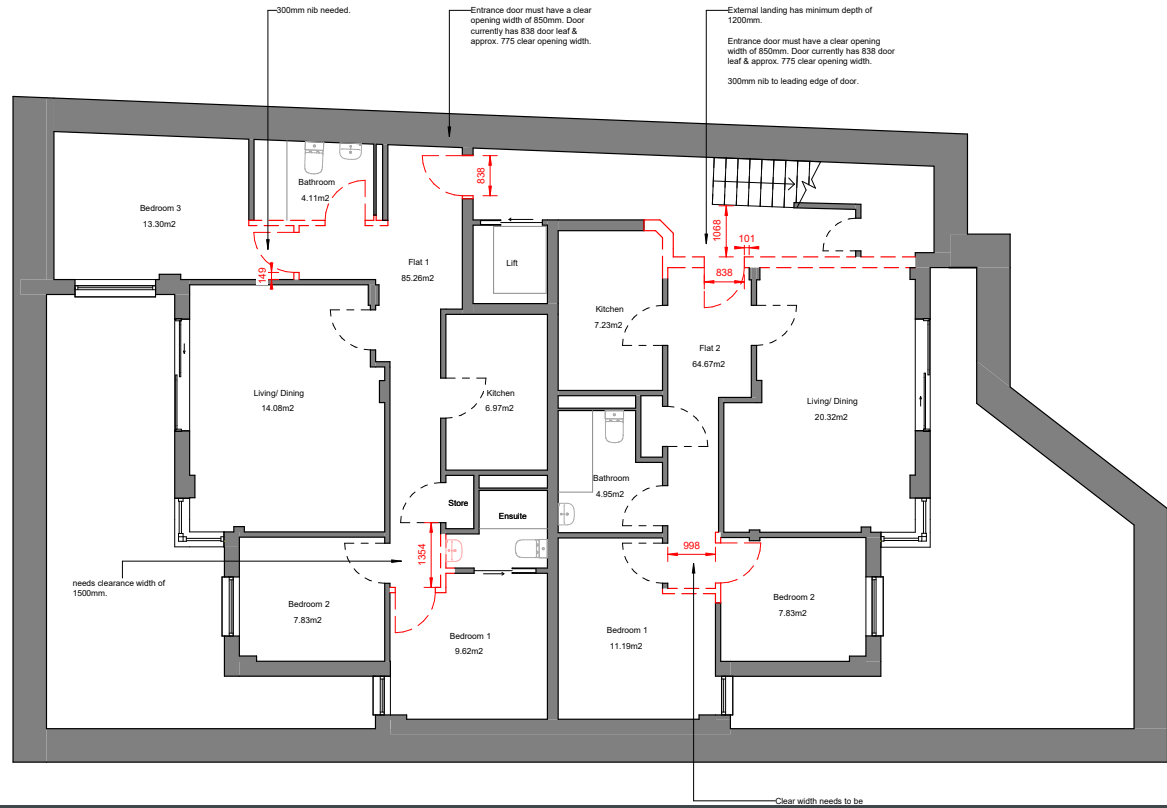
BLOCK 3 APPROVED LOWER GROUND FLOOR PLAN
